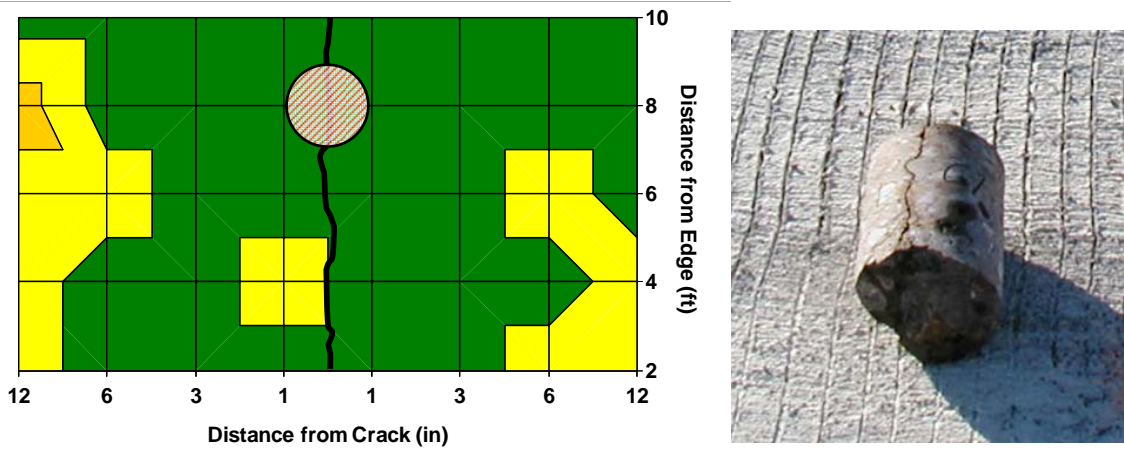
Contour Map around Crack on Section 1 of SH 288.
